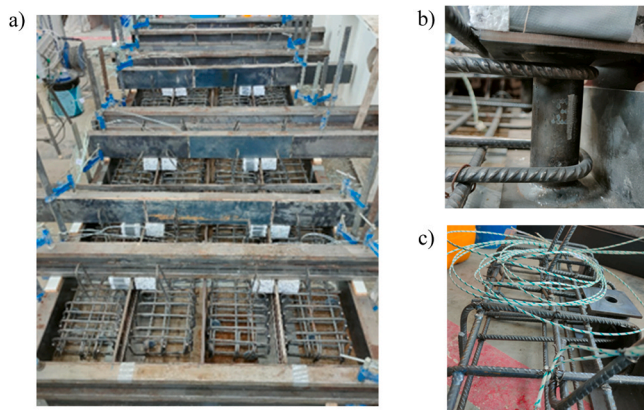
Formwork (a) and details of the reinforcement (b, c) for the cylinder system before concrete pouring.
